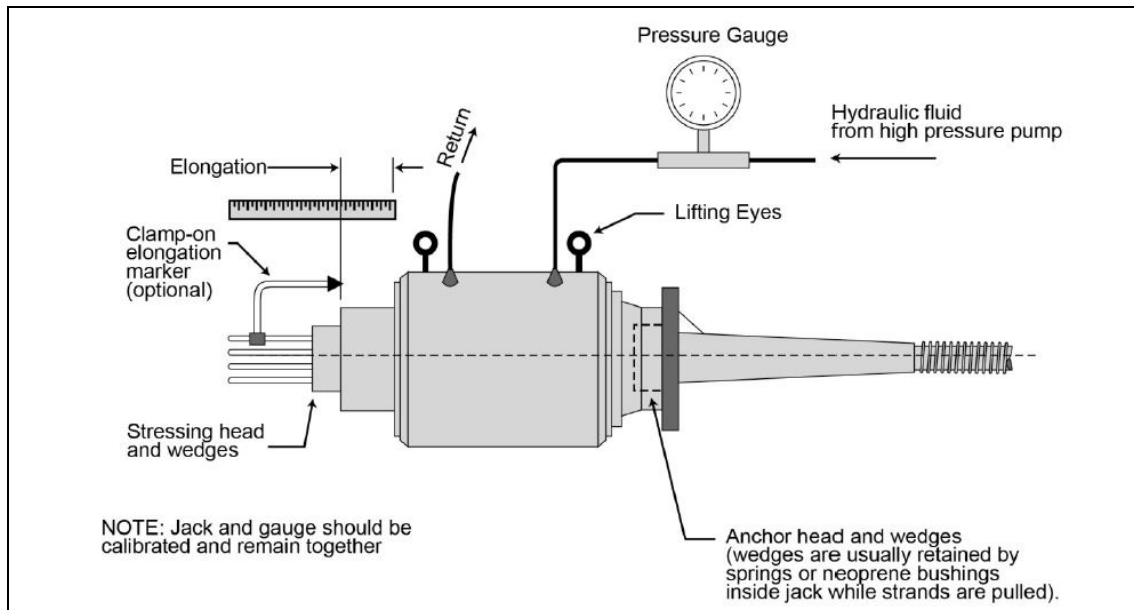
Prestressing Equipment (Strut Beam) for Post-Tension Girder (At the Site)
